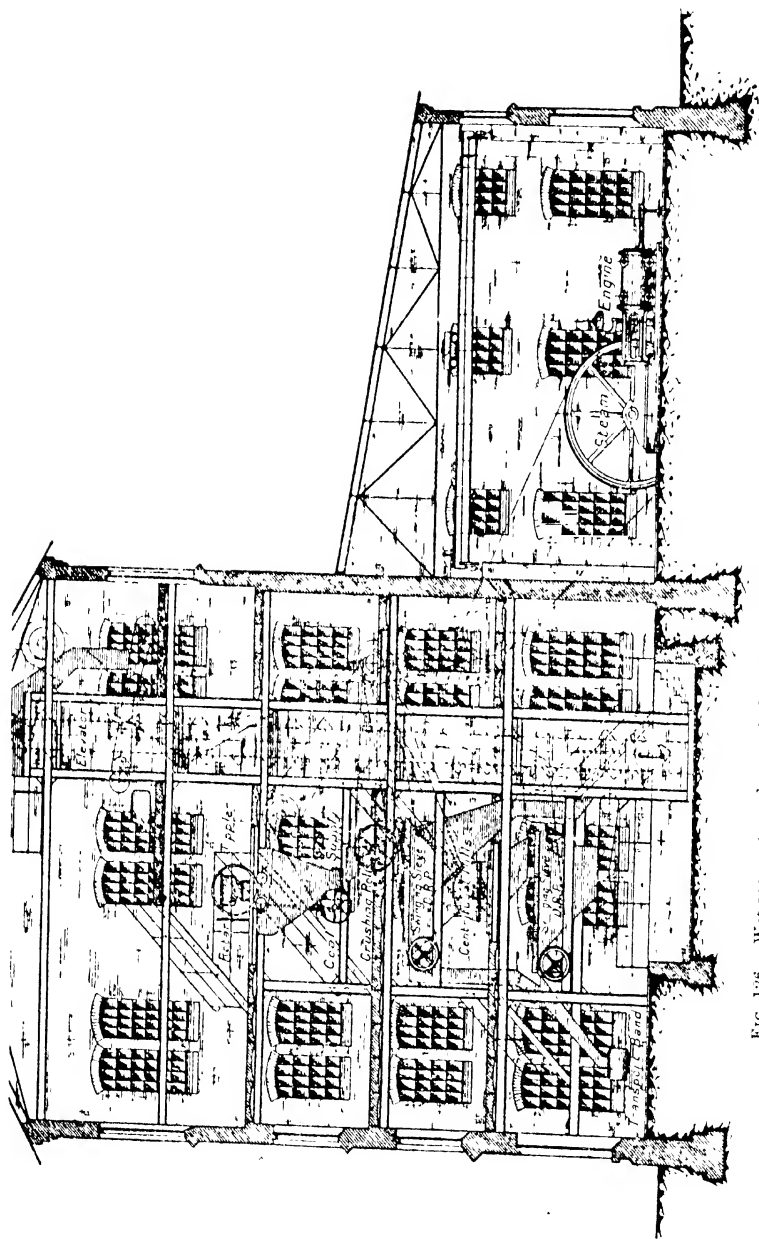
Wet-preparation plant with drive from a steam engine. Maschinenbau Buekan scheme.
